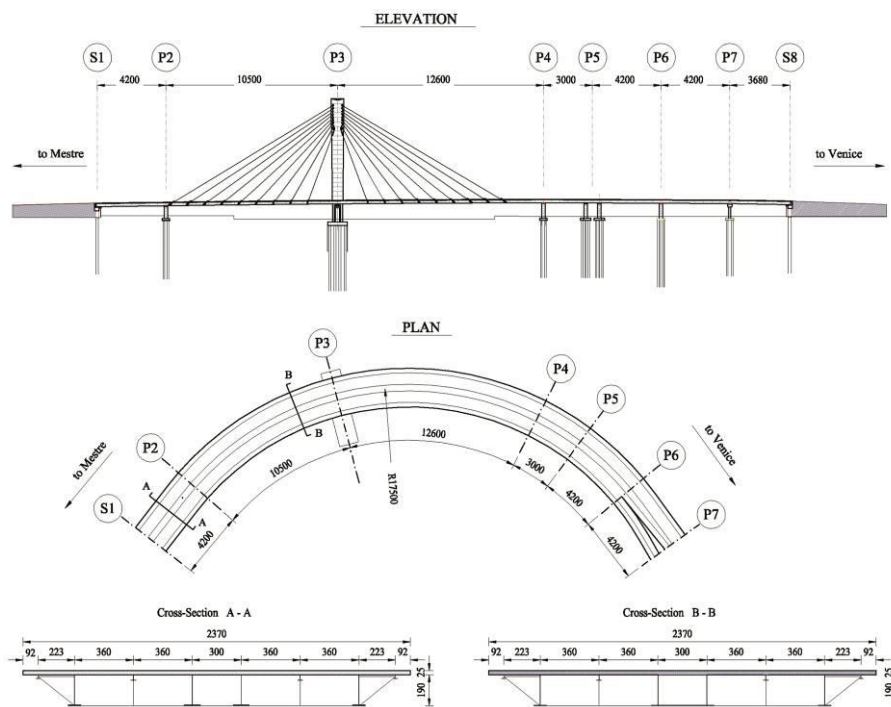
Elevation, plan and typical cross-sections of the cable-stayed bridge in Porto Marghera
